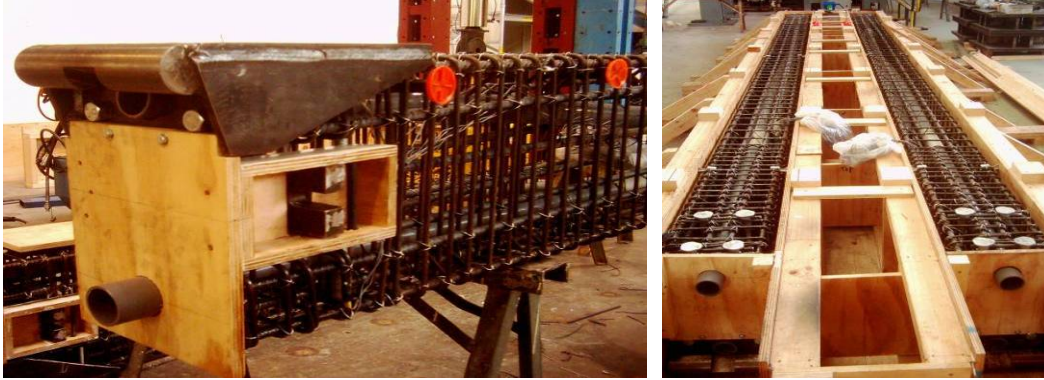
Construction process: final connection detail (left) and formwork ready to cast (right).
